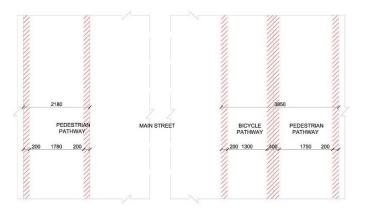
Street width and buffer spaces (in mm) for Gateway 14 in the area surrounding Offenbach am Main Hauptbahnhof
